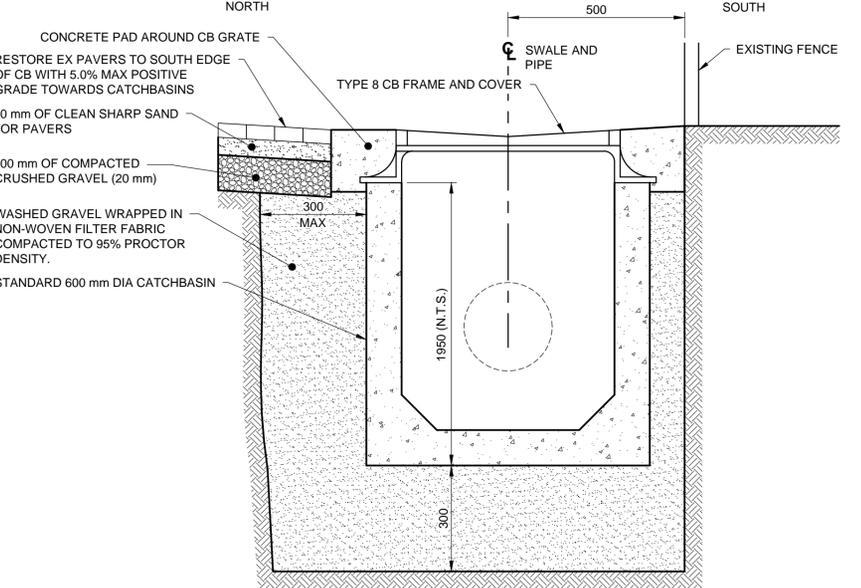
DETAIL "B" - NORTH CATCHBASINS CROSS SECTION
